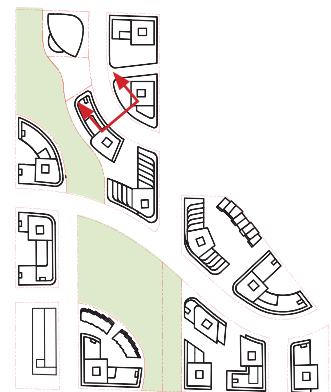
New Commercial Street (Extension of McGuigan Avenue)
